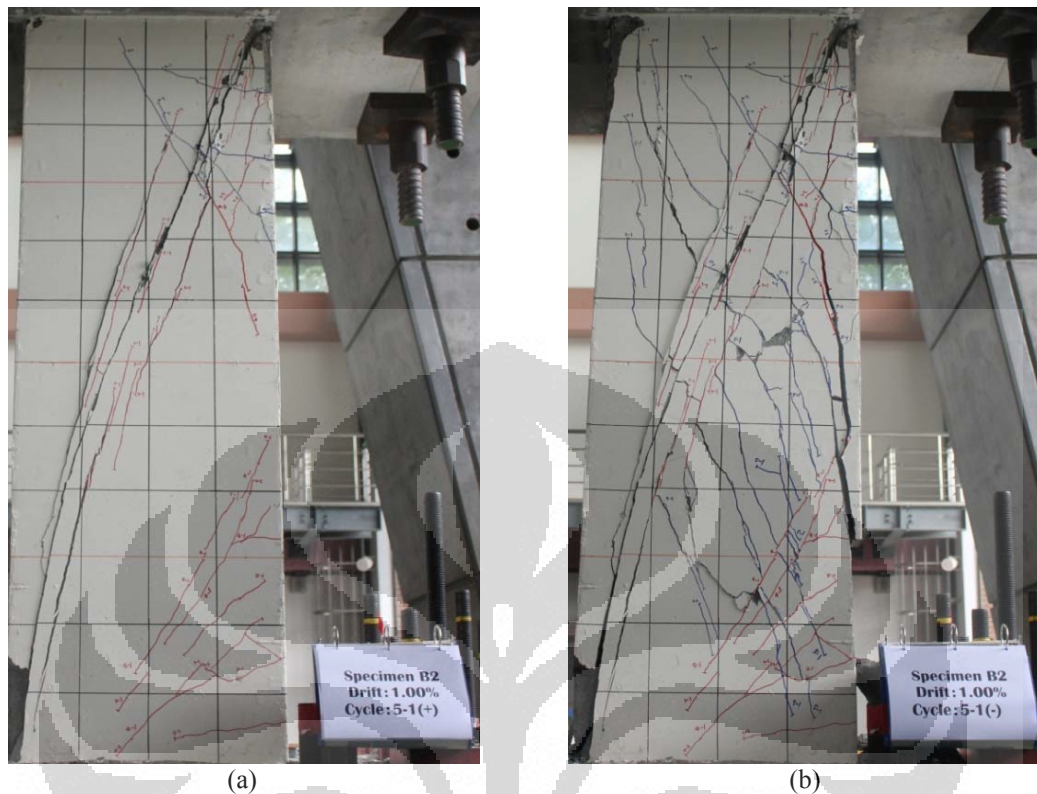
Large diagonal shear crack of column B2 (1.0% drift ratio) in west side.
